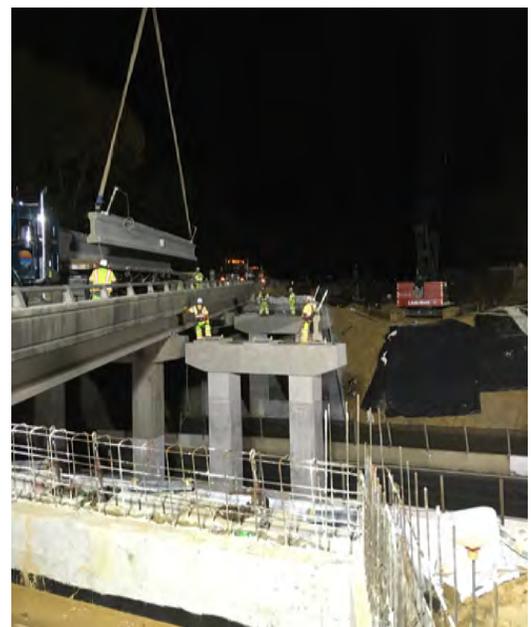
Beam Erection at Widened Bridges
